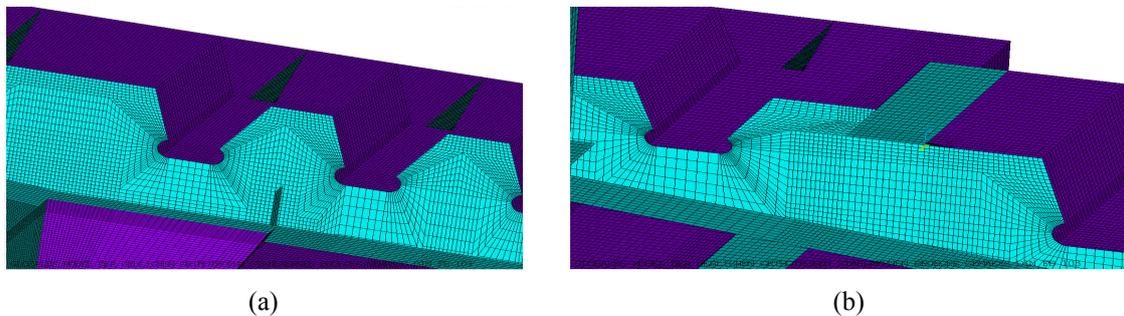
(a) Connection of cross-beam to main girder; (b) connection of deck plate to pedestrian road
